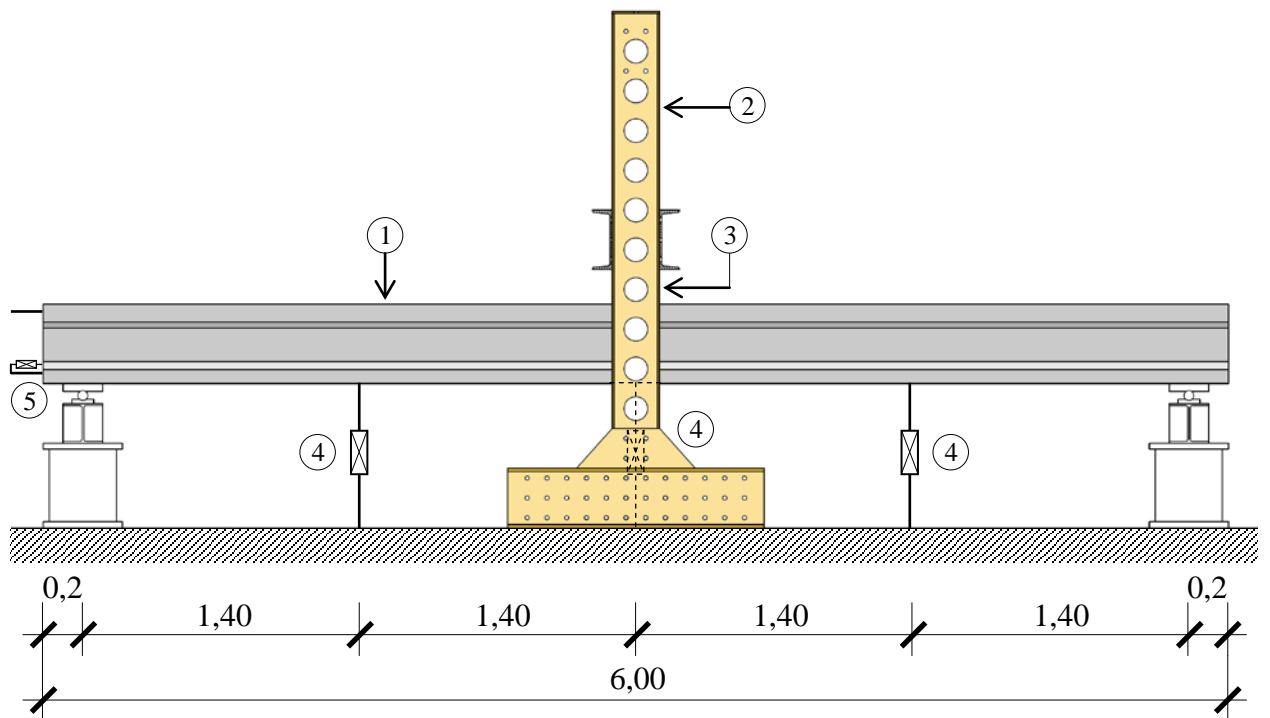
Arrangement of the load test (1–reinforced concrete beam specimen; 2–loading frame; 3–LUKAS 250/200 hydraulic jack; 4–HBM50 inductive displacement pick-up; 5–HBM20 inductive displacement pick-up).
